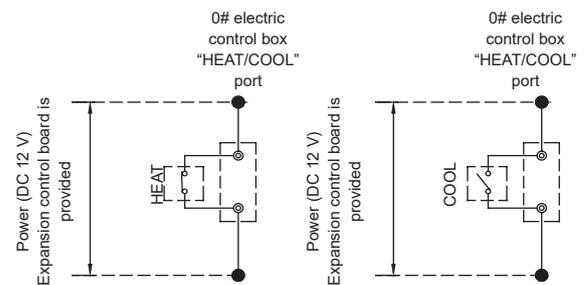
Wiring of "HEAT/ COOL" weak electric port
